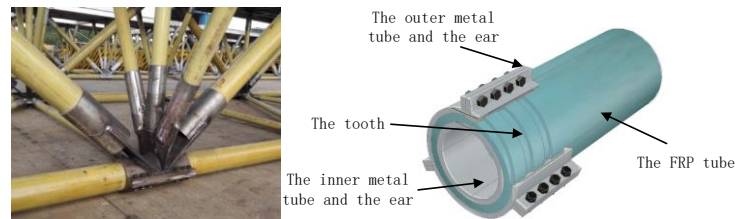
Pretensioning tooth joint for the composite-metal hybrid assembling stringed truss bridge
